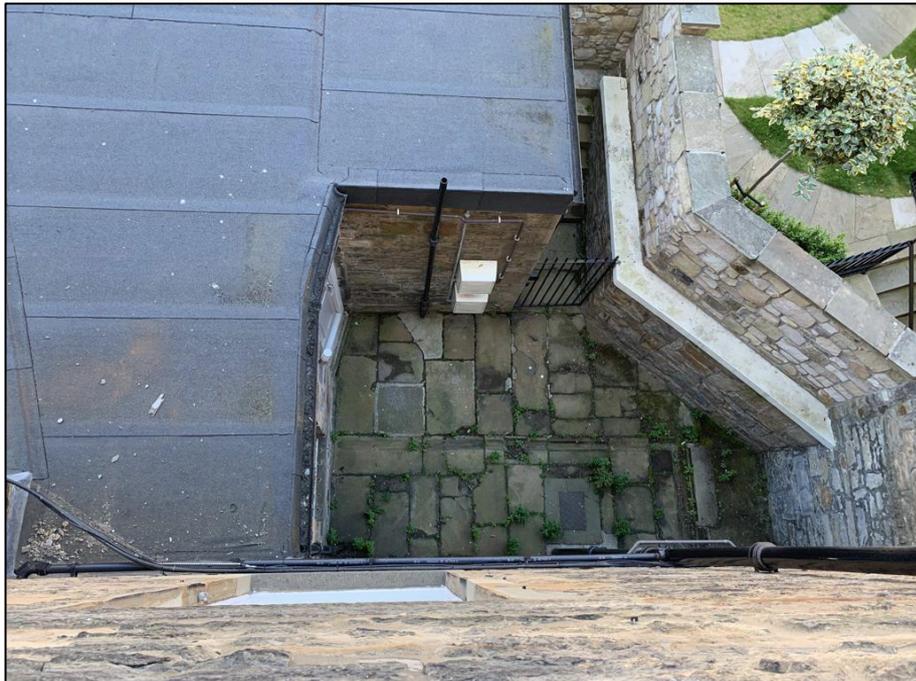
Rear Courtyard to 13A Manor Place showing height of surrounding walls
